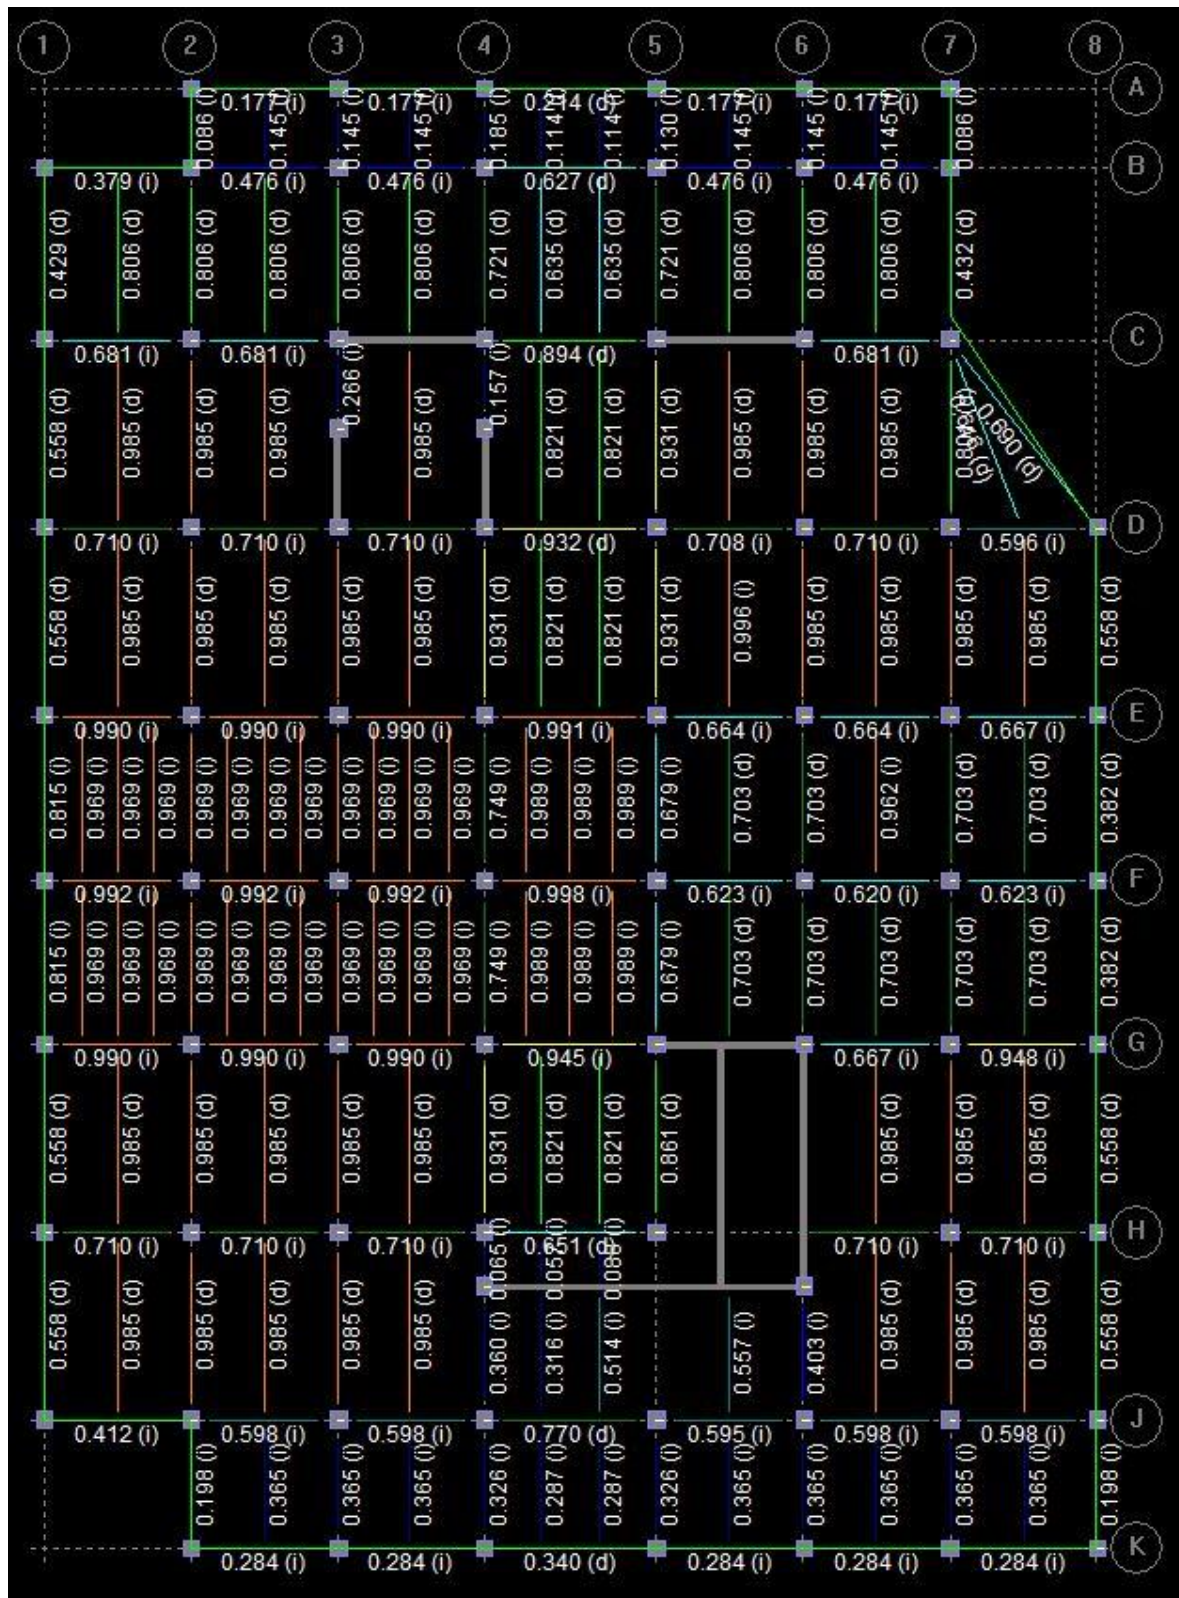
5<sup>th</sup> Floor Steel Utilization
